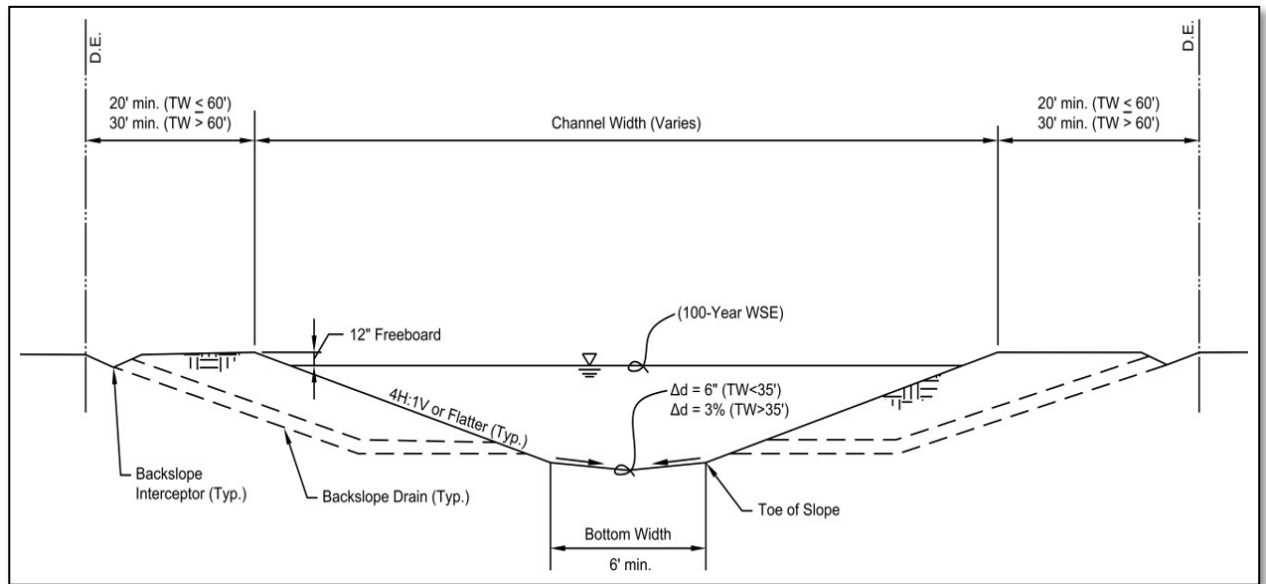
Typical Grass-Lined Trapezoidal Large Channel Section
